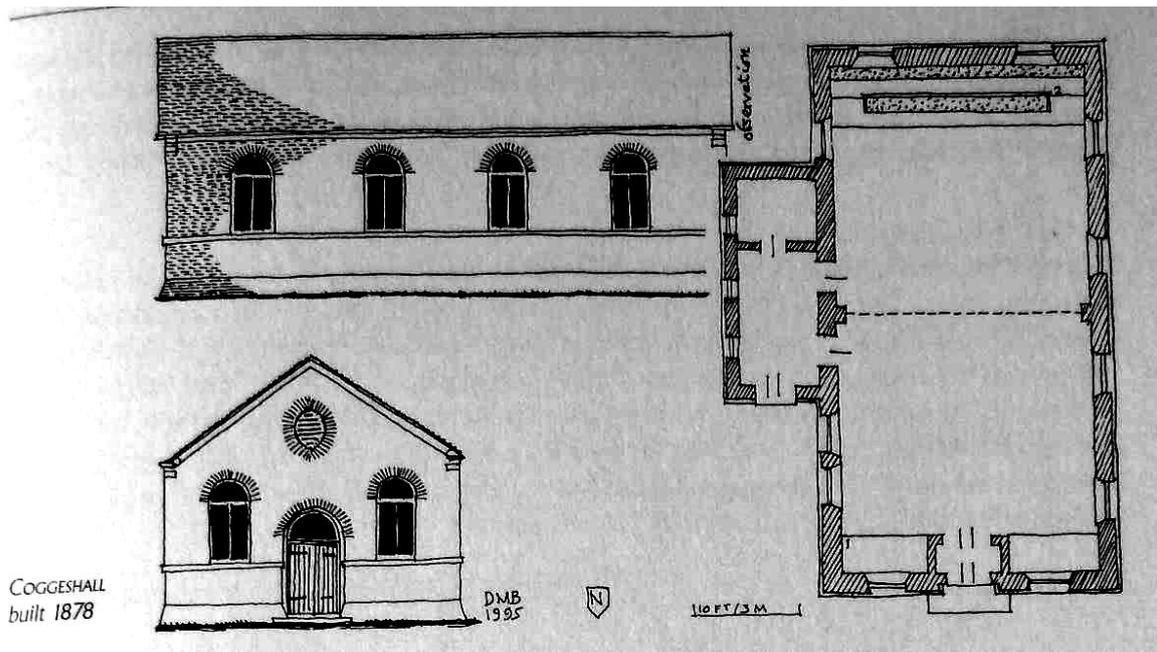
Plan and elevations of 1877 building, from Butler, p. 179
